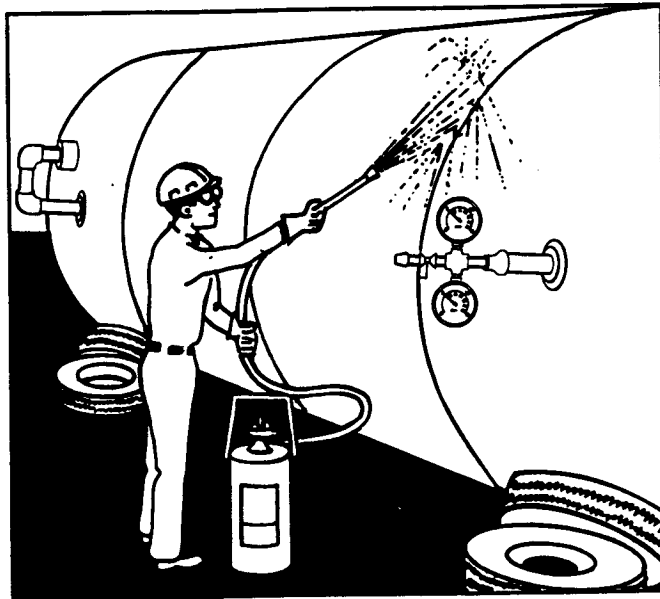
Preinstallation pressure test. Pressure test conventional single-wall tanks at three to five psig. Soap all surfaces, seams, and fittings while carefully inspecting for bubbles. NEVER TEST AT PRESSURES OVER FIVE PSIG.
